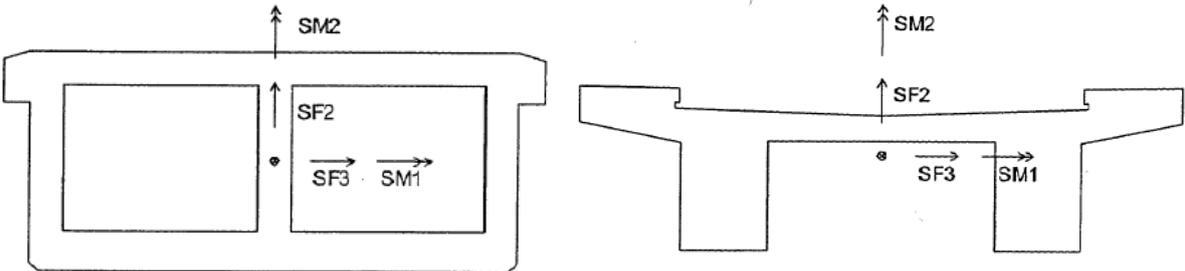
Sign conventions used for section forces for the arch (left) and the top slab and beams (right) used by Leander-Fredriksson (2003), p 8.2
